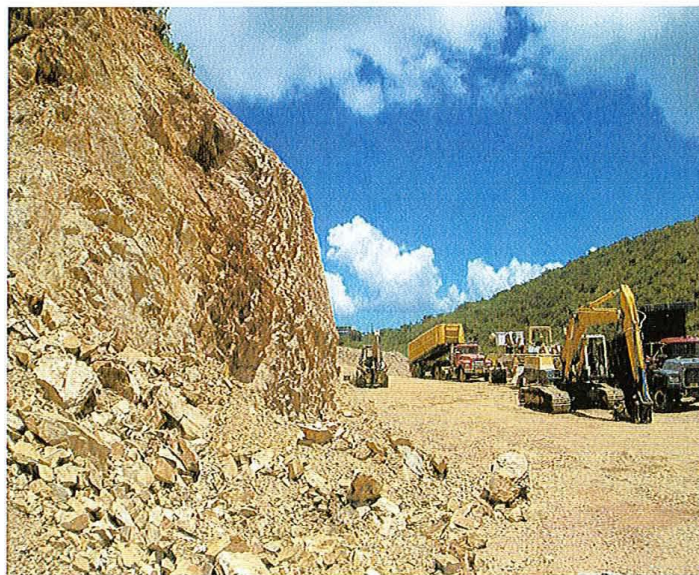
Lower Portion of the Collapse at its North End, Looking Toward North.
